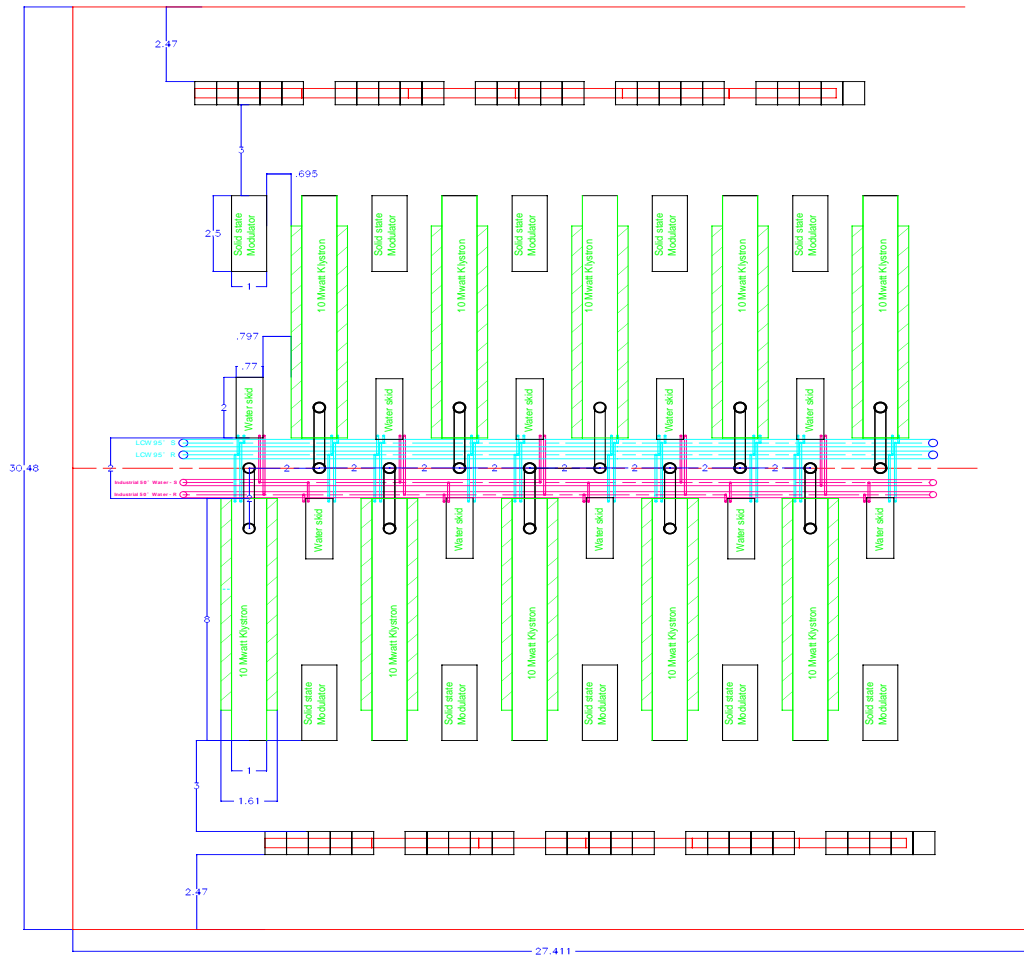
Partial floor plan of equipment gallery for the cooling channel.
